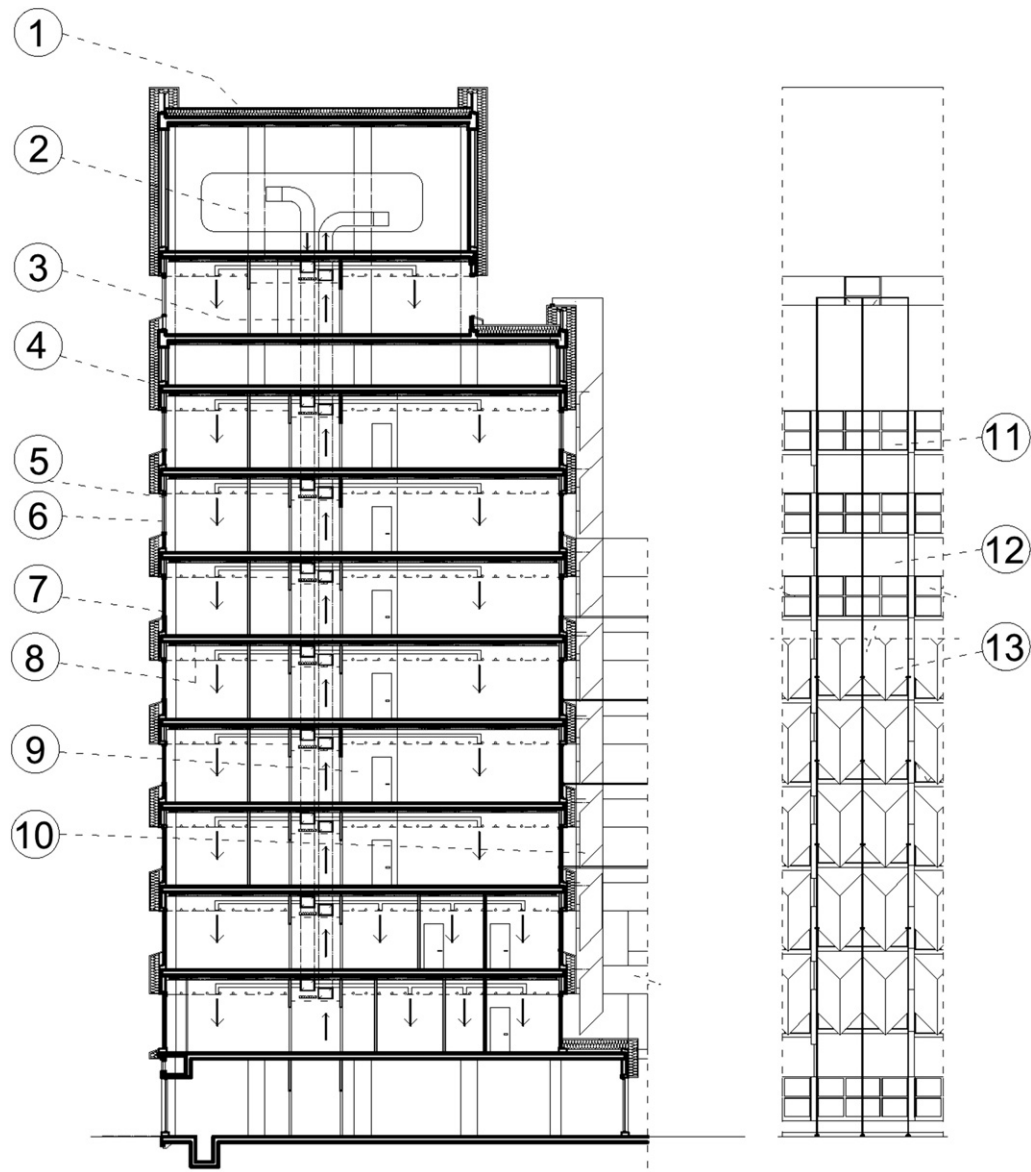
Option 2: SMVRHC, sealed building, mechanical ventilation, radiant ceiling for heating and cooling. Key: 1 Insulation on roof (100 mm); 2 Air handling unit with supply only; 3 Supply duct; air supplied to wards via ceilings, fresh air only; 4 100 mm insulation to external elevations; 5 Seal windows; 6 Triple glaze windows; 7 Radiant ceiling active; 8 Insulation to slab above radiant ceiling; 9 Extract via bathrooms; 10 External shading, perforated aluminium panels; 11 Triple glaze and seal windows; 12 100 mm external render; 13 External shading.
